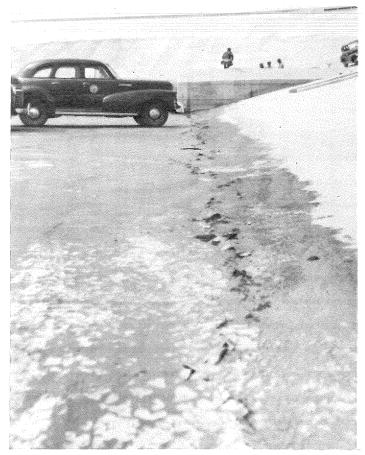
Buckling of asphaltic paving, May 11, 1951.
